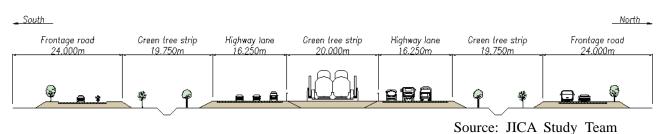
Cross section of the highway above which the railway is built in the suburban route
